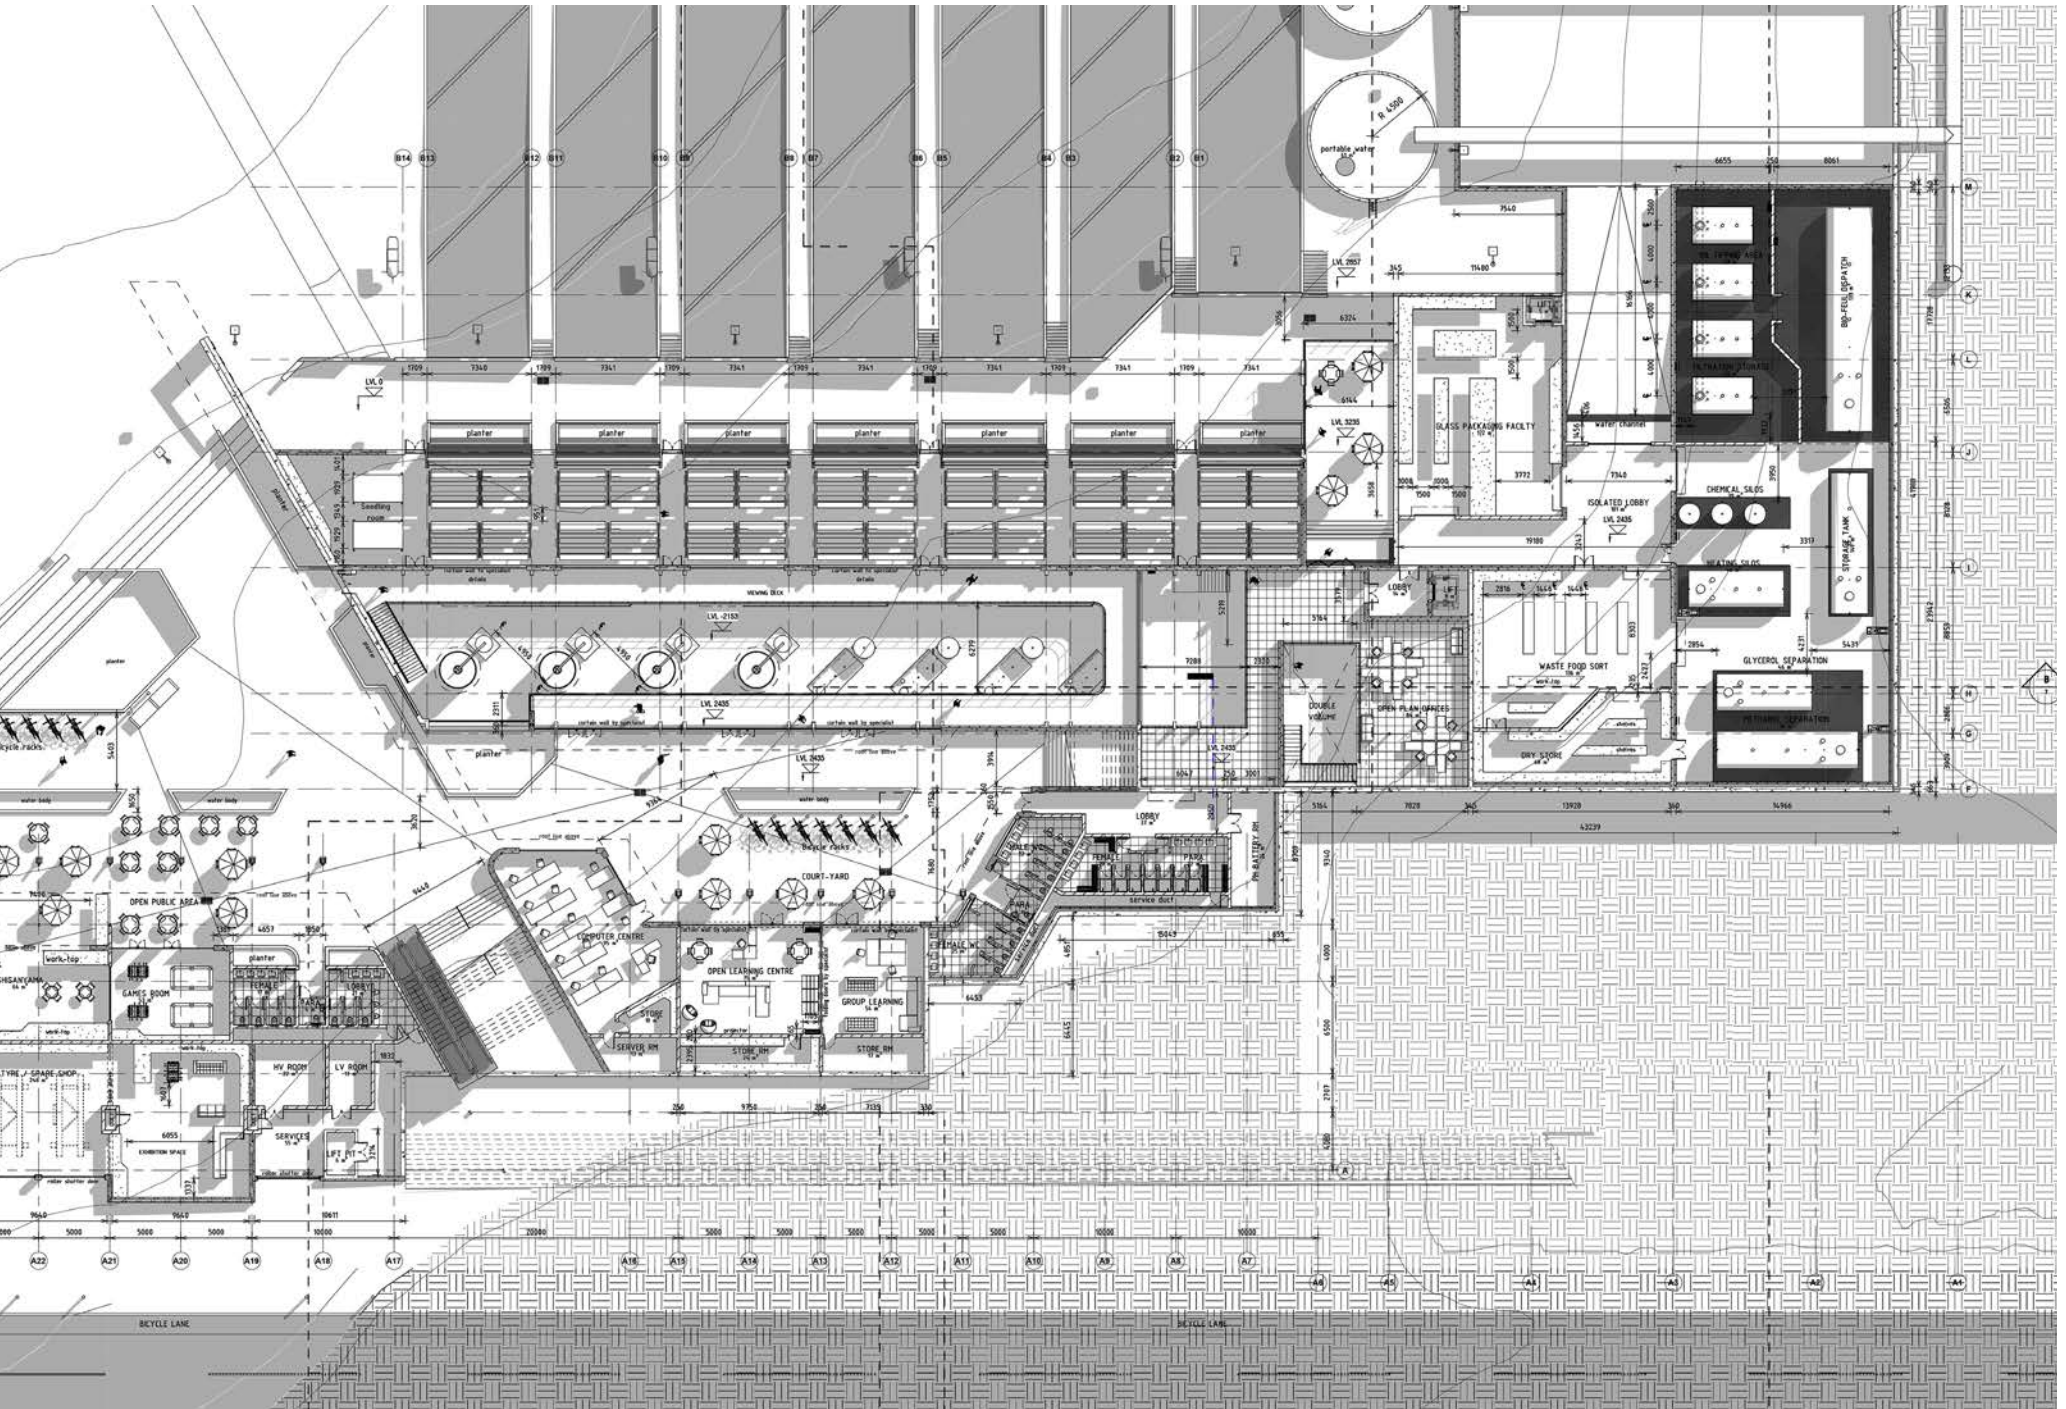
Lower Ground Floor Plan (Author 2018)
